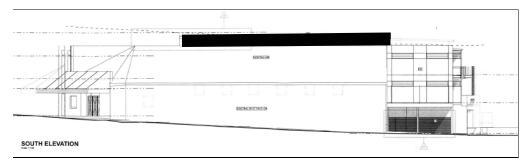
Southern Elevation of the approved development (cinema 2 roof projection highlighted in black)
